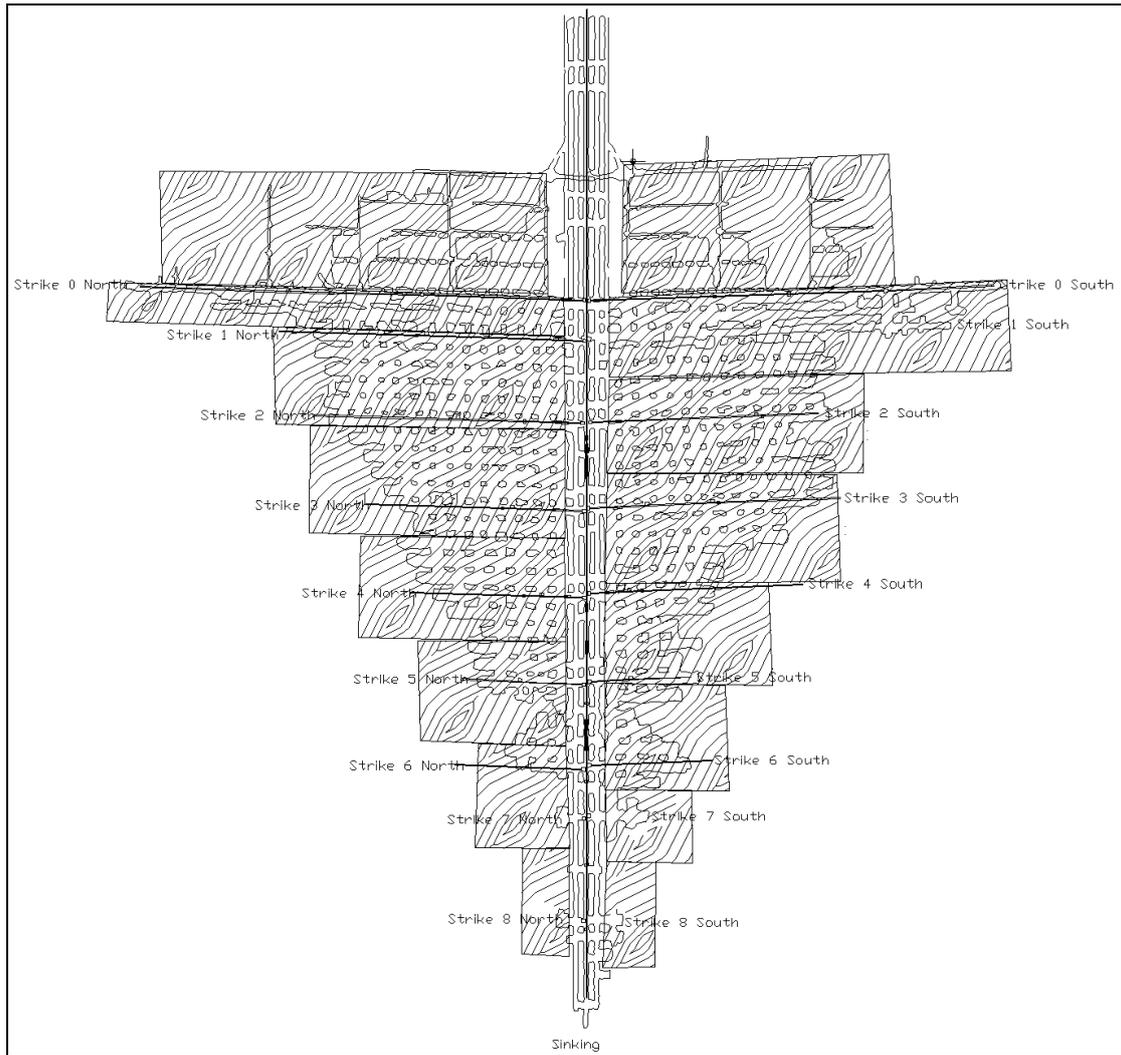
Plan over a conveyor system in an underground on-reef room-and-pillar mine
